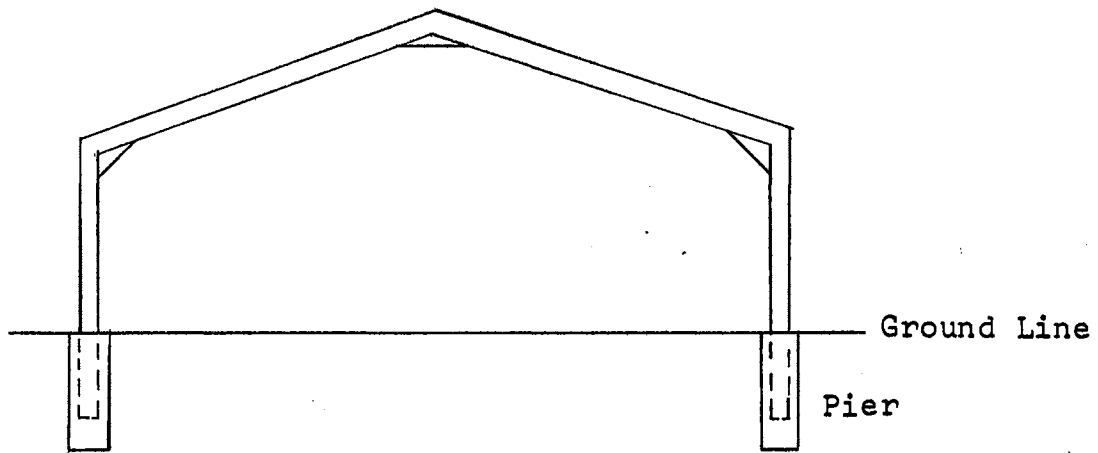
Hingeless Frame with Cylindrical Pier Foundations.
